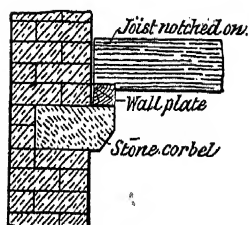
Section through Wooden Floor carried on Stone Corbels.
